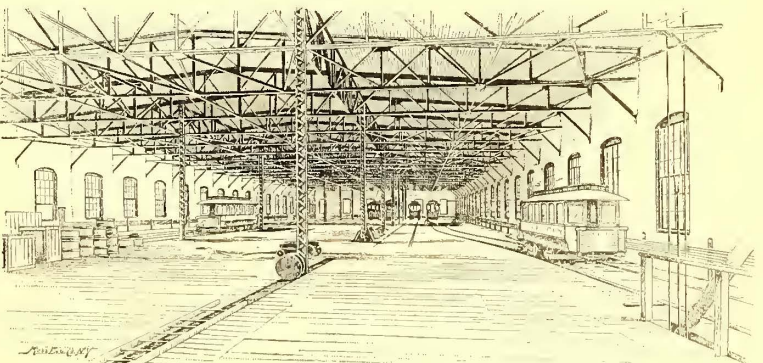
SECOND FLOOR OF CAR HOUSE—WORCESTER TRACTION CO.
